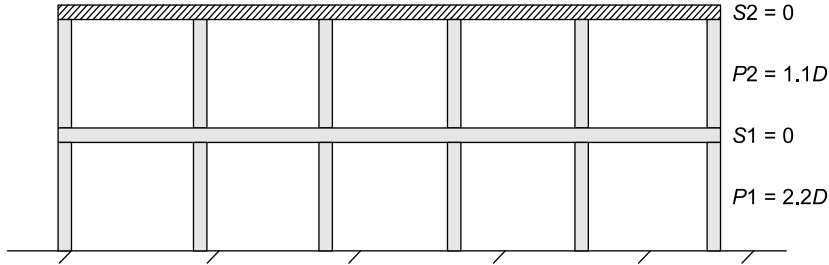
Removal of Construction Load After Casting of Slab 2 is Over.
